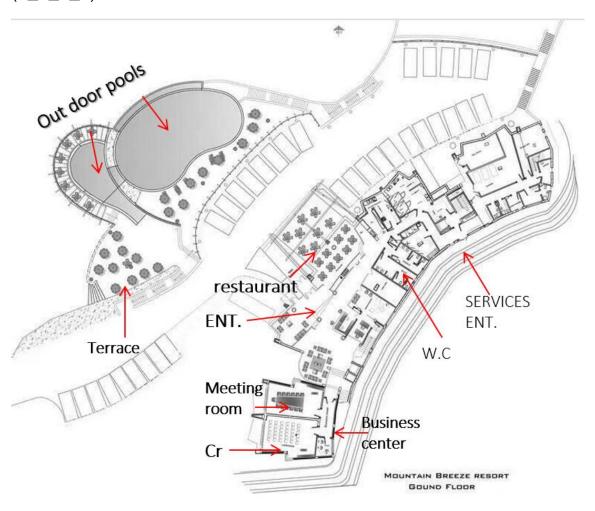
SHOWS THE GROUND FLOOR PLAN
